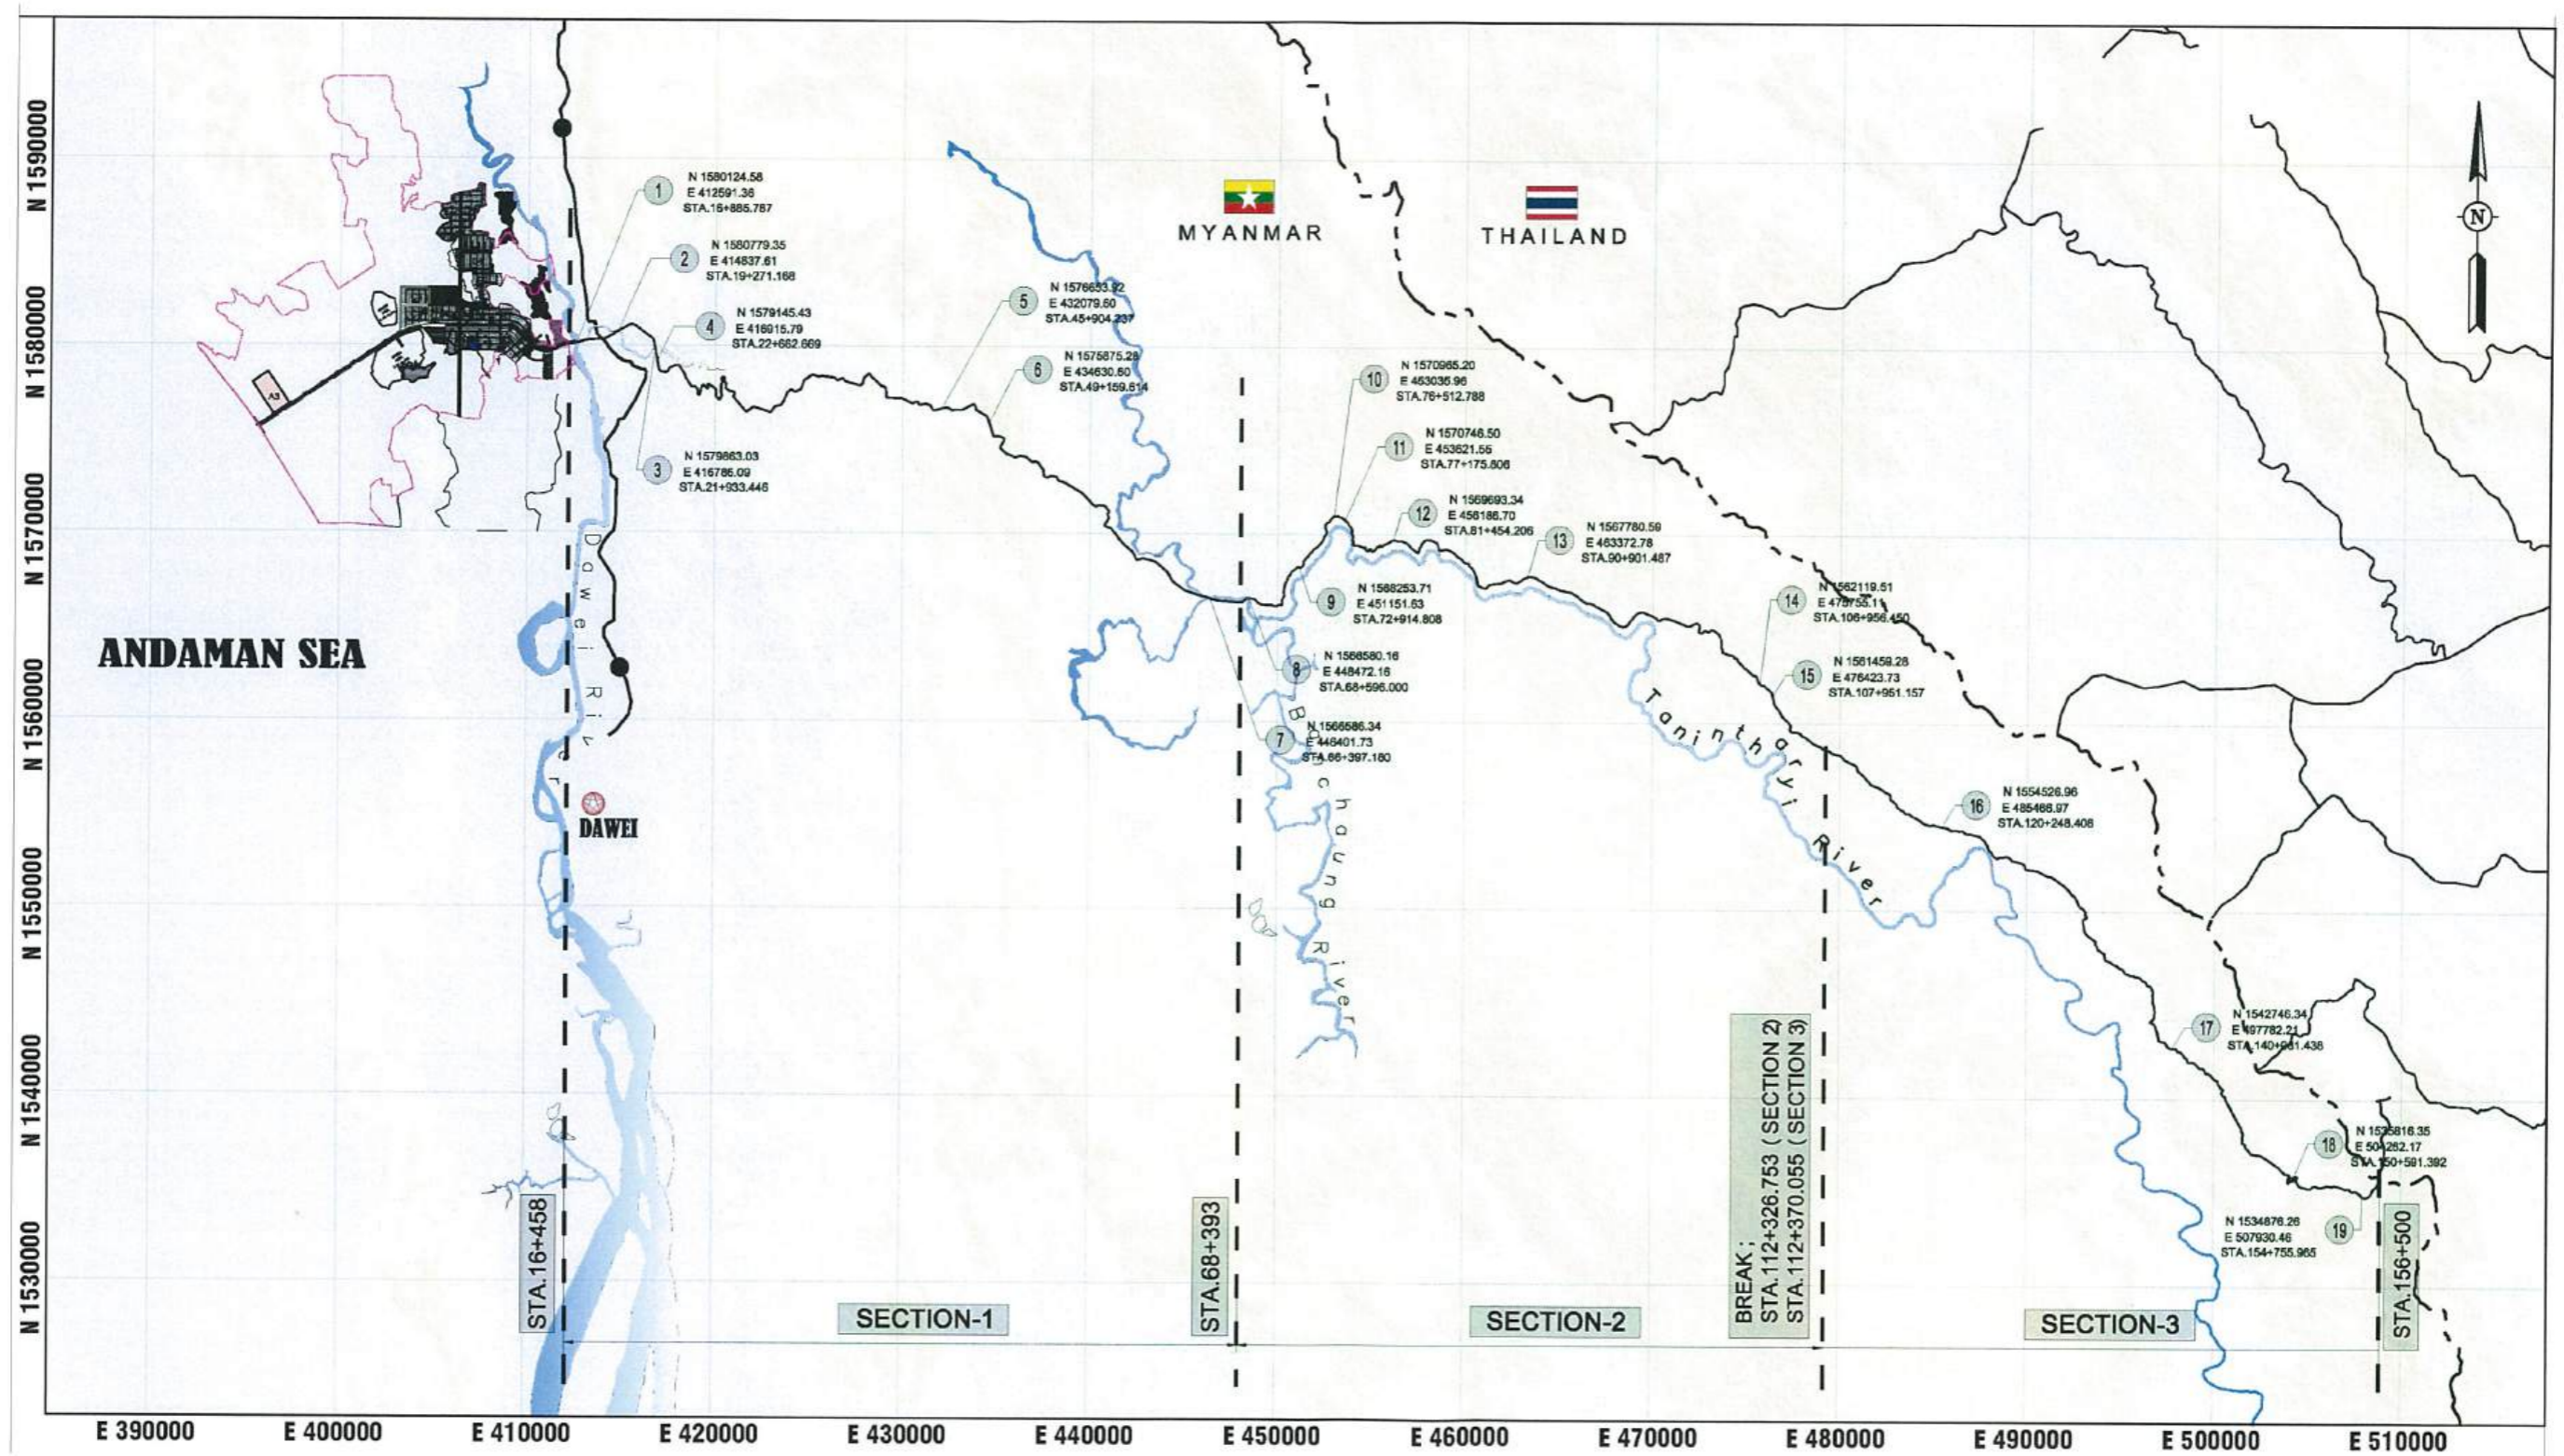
LOCATION OF 21 BRIDGES OF TWO LANE ROAD PROJECT
